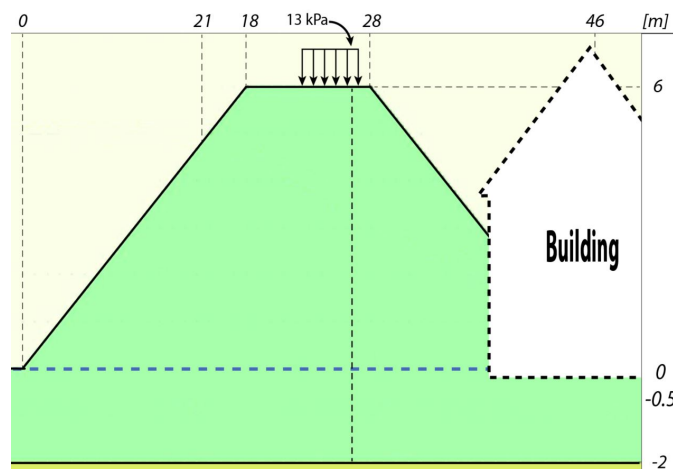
Increased soil pressures on soil retaining wall induced by a traffic load
